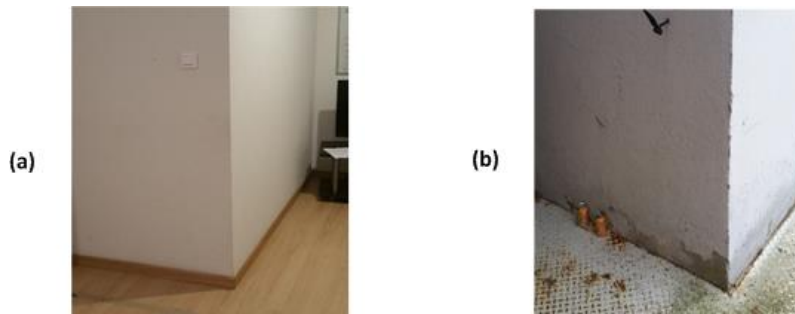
Wall made of (a) plasterboard, (b) concrete
